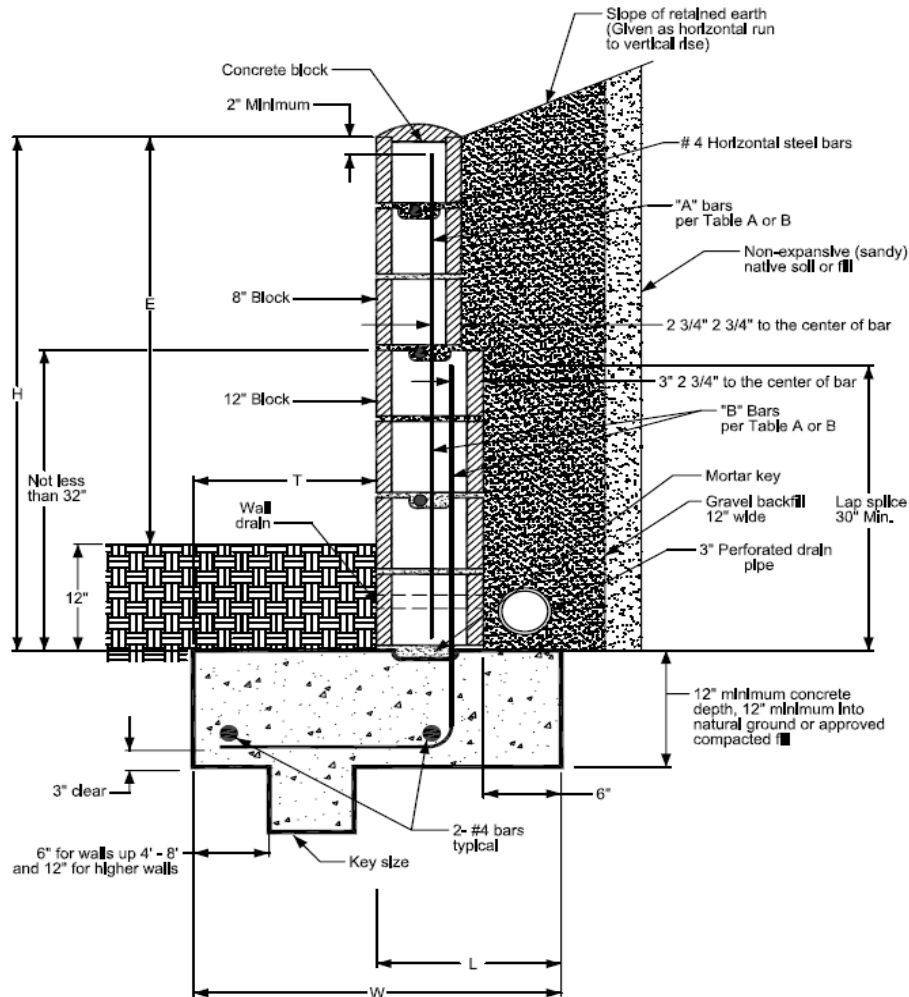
/ Type III Retaining Wall with Level Sloping Backfill
